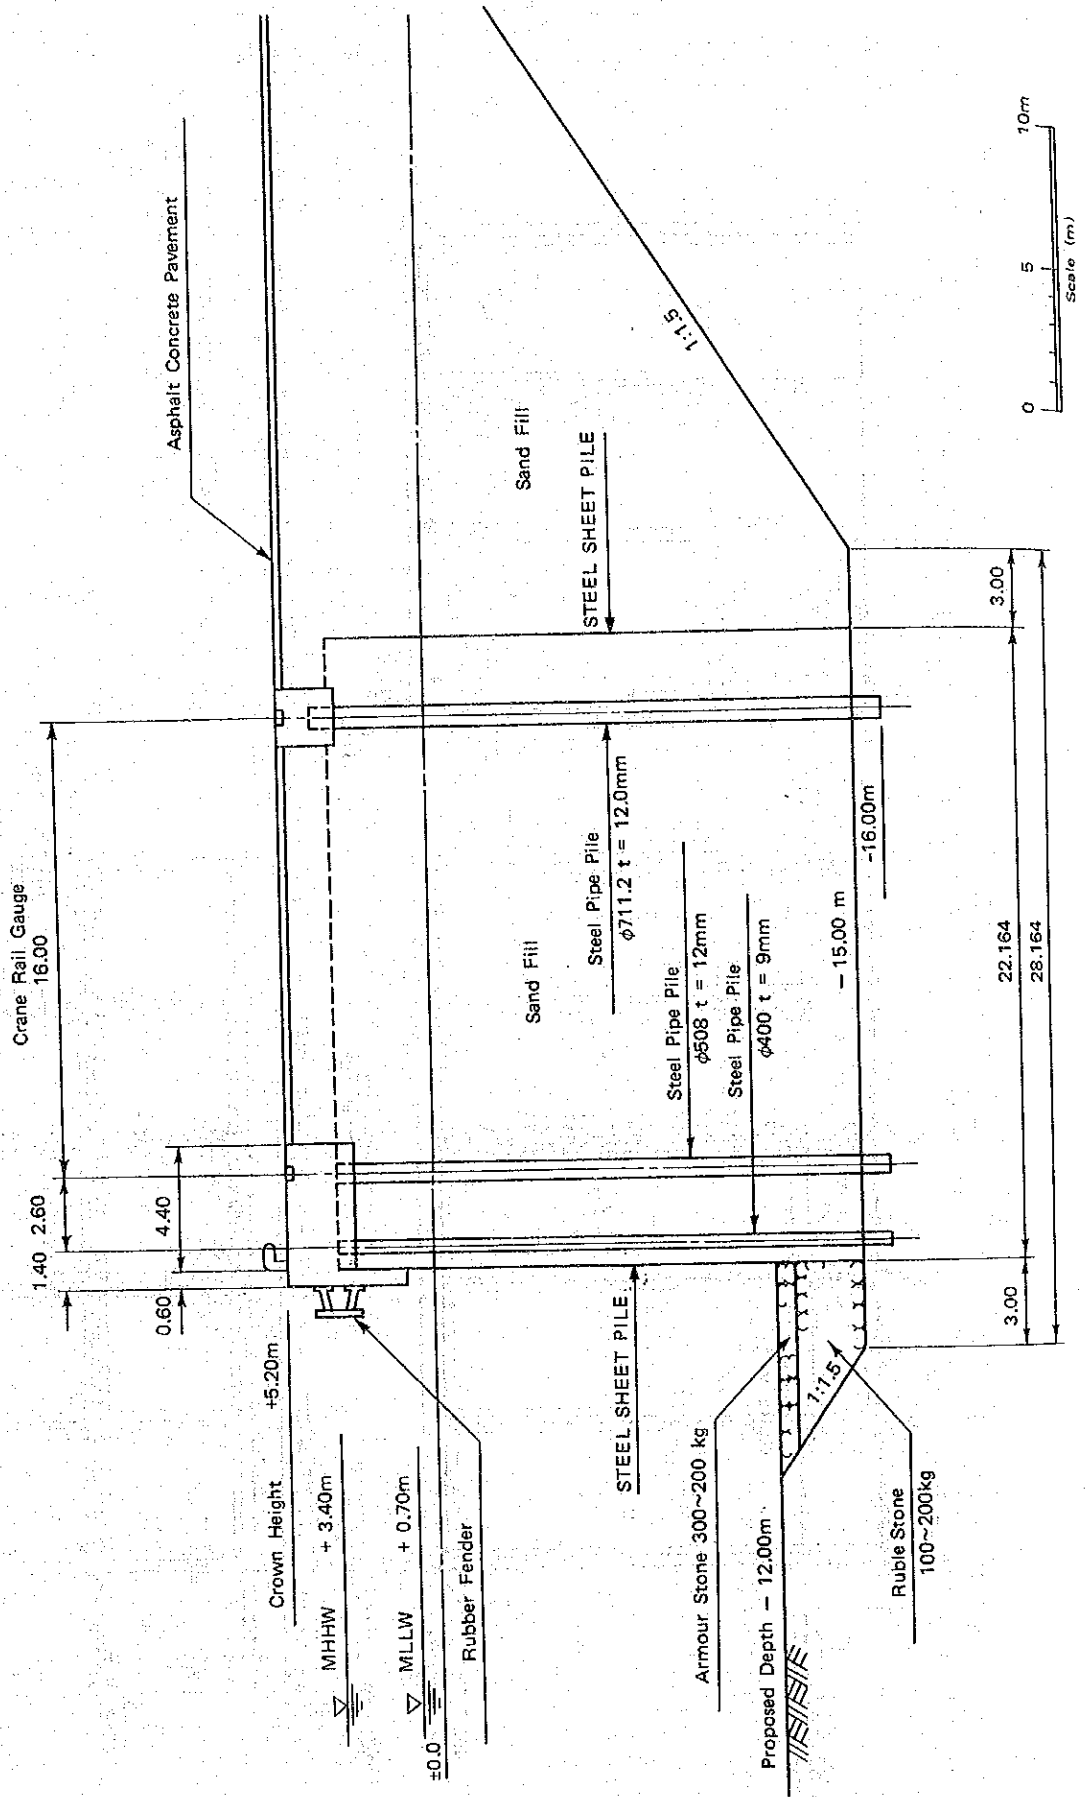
Port Qasim Container Berth (Steel Sheet Pile Cellular Cofferdam Type Quaywall)
